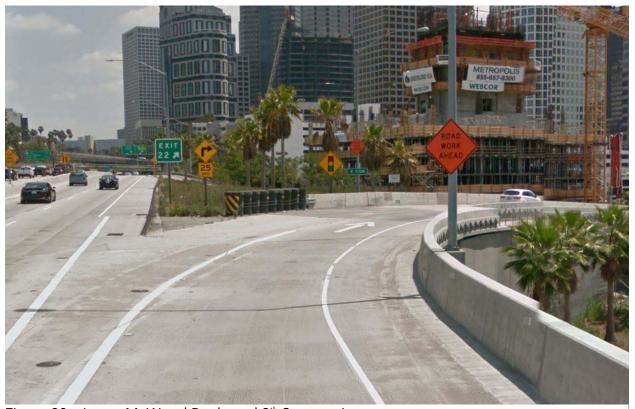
James M. Wood Boulevard 9th Street exit ramp
